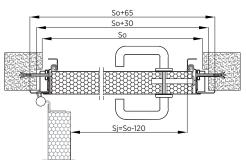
Installation of a single-leaf door to a masonry wall – corner frame with a thermal break – horizontal cross-section
